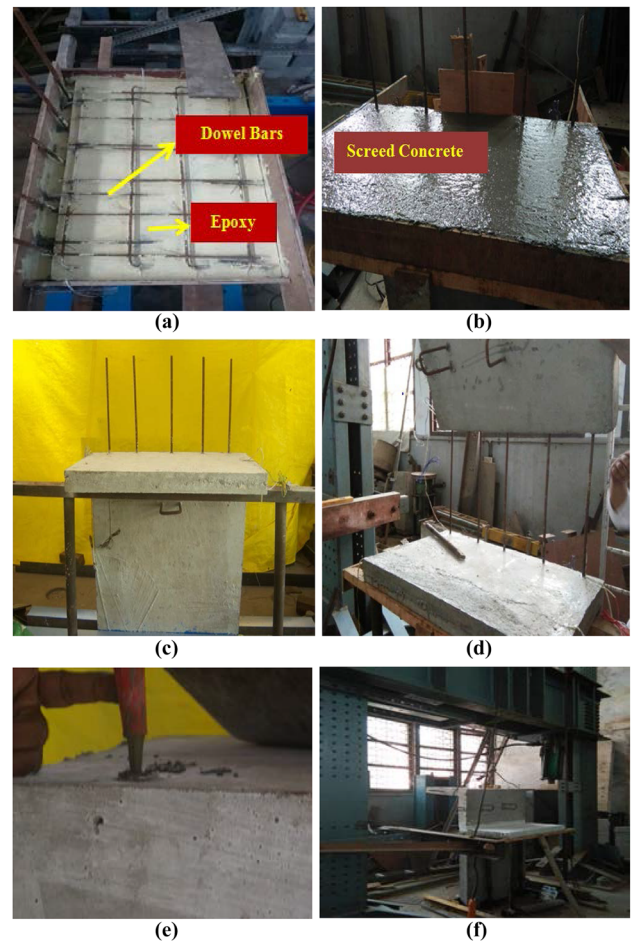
Construction sequence of precast specimen. a Erection of lower panel and connecting dowels with topping reinforcement and application of epoxy coating; b cast-in-concreting; c erection of precast shear wall–lower panel and slab; d erection of upper panel; e grouting; f final stage of specimen
